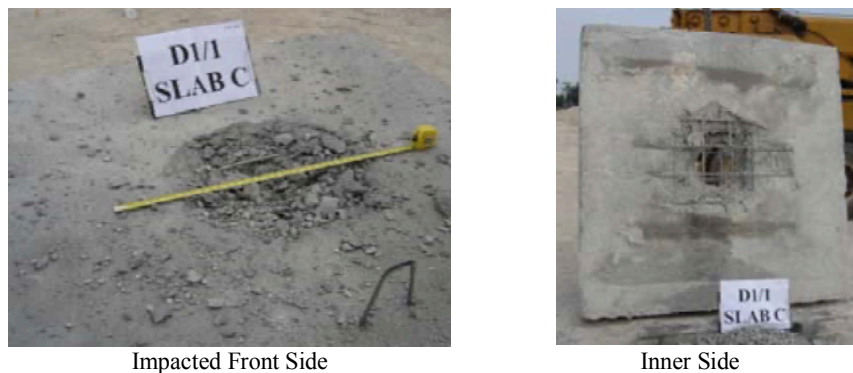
Damage Pattern of a 30 cm Massive Wall Exposed to 2 kg TN (Fang et al., 2008)
